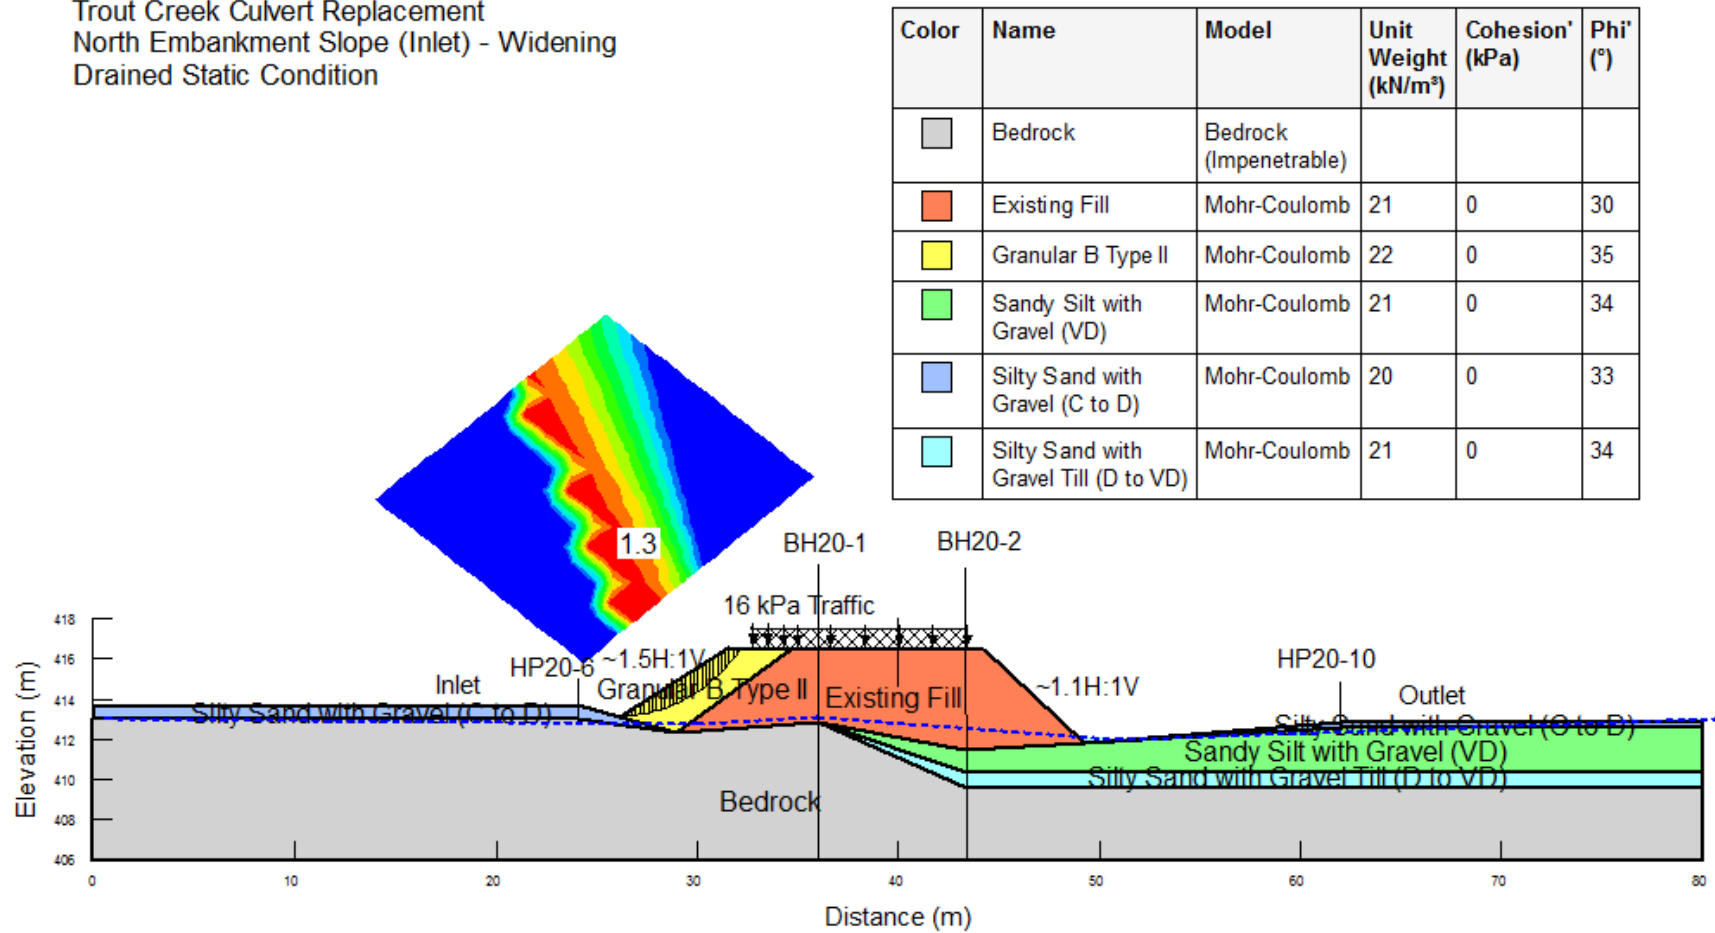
Slope stability analysis for temporary widening north side of embankment (1.5H:1V) – drained static condition
